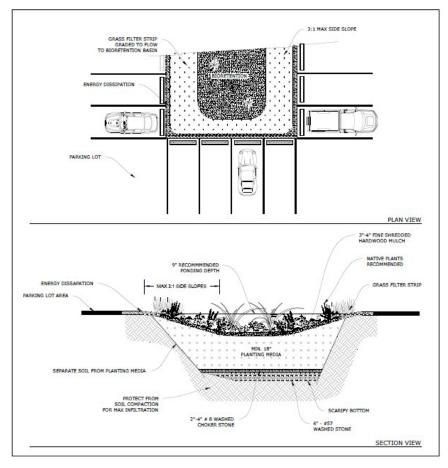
5 Schematic of Typical Bioretention Area Without an Underdrain (Source: AECOM 2015)
